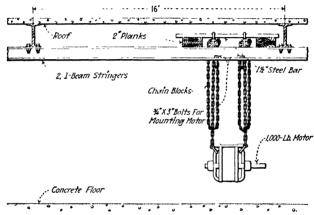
Arrangement for hoisting a motor to a ceiling in which no holes could be bored. (H. S. Rich, *Industrial Engineer.*)
